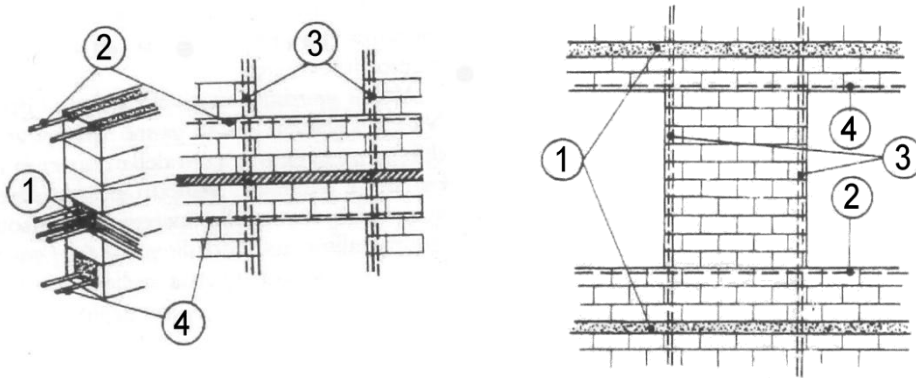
Reinforcement of the spandrel between two overlying openings (left) and reinforcement of window pier (right); 1. tie-beams, 2. reinforcement of threshold, 3. vertical reinforcement, 4. lintel reinforcement (from Giuffrè, 1980).
